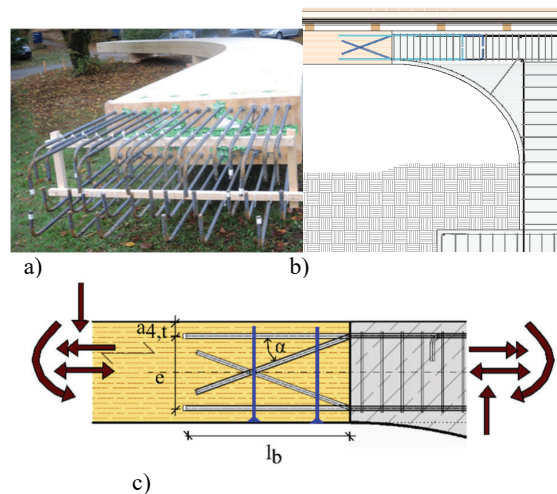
Integral GLT-RC support embankment a) primary superstructure GLT beam with glued-in rebars; b) scheme of the integral joint/support solution, c) detail section of the integral joint
